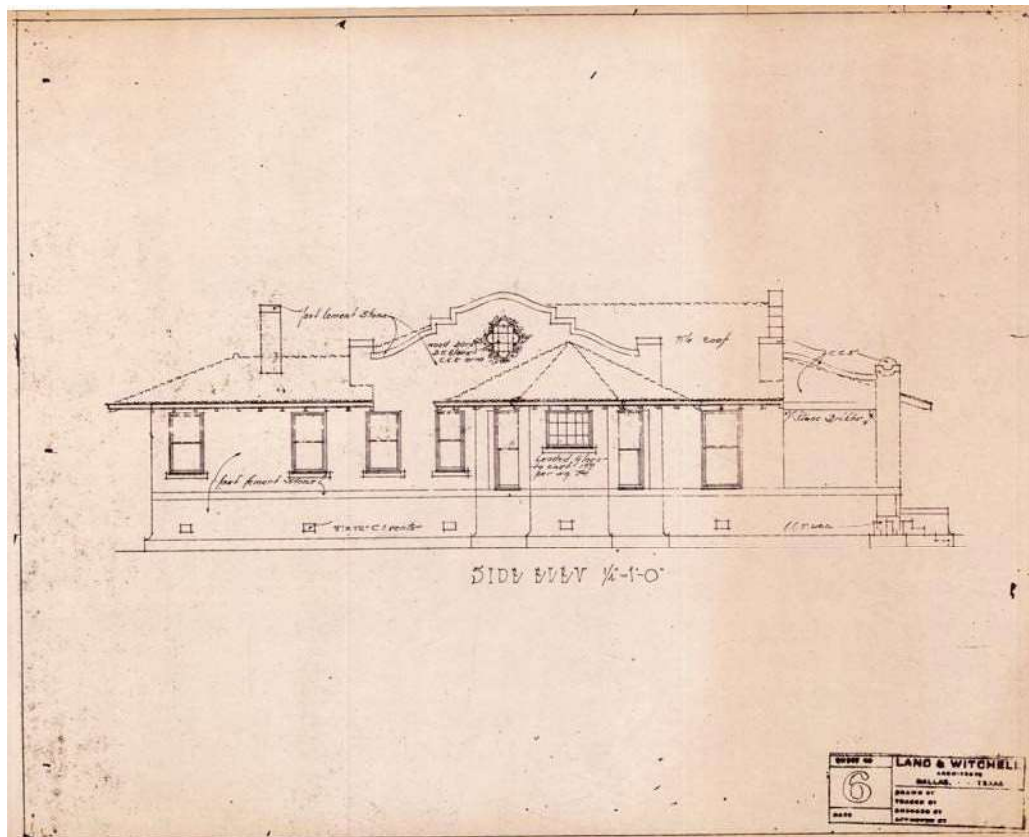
Original Lang and Witchell Side (Southwest) Elevation – Sheet 6
